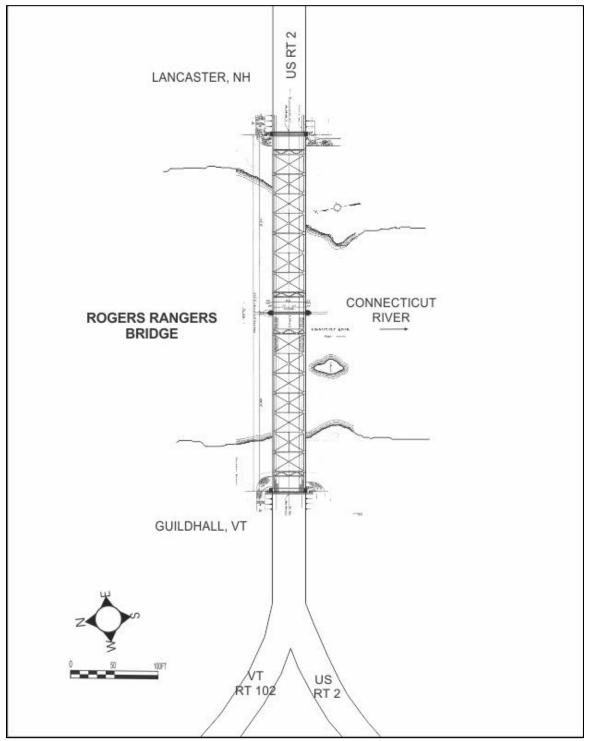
Site Sketch. Source: NHDOT, Original Plans.
